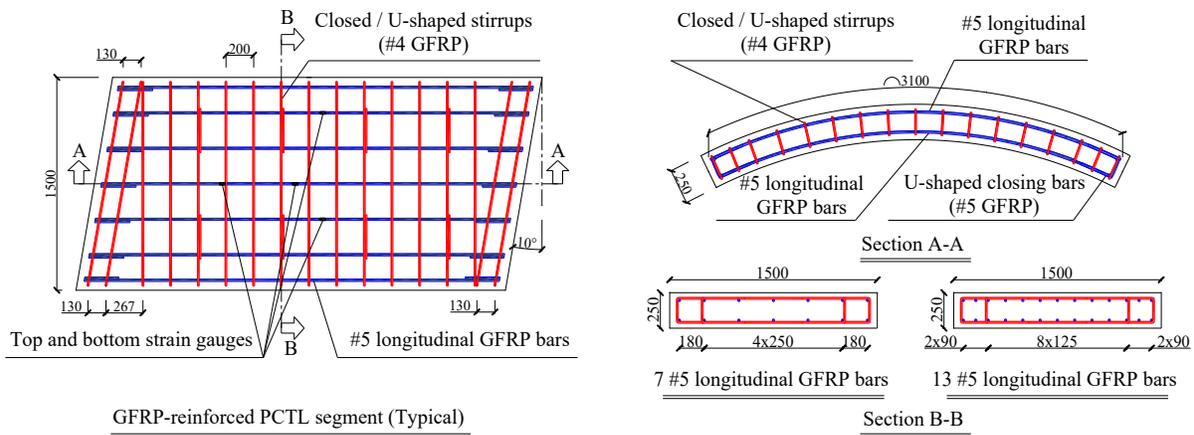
Dimensions and reinforcement details of the test segments. (Note: all dimensions in mm)
